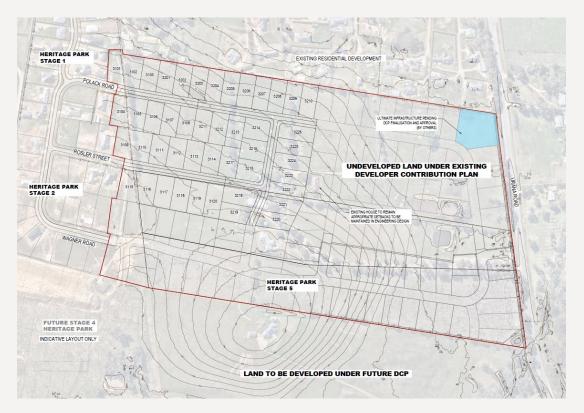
Proposed subdivision layout plan (aerial overlay)
